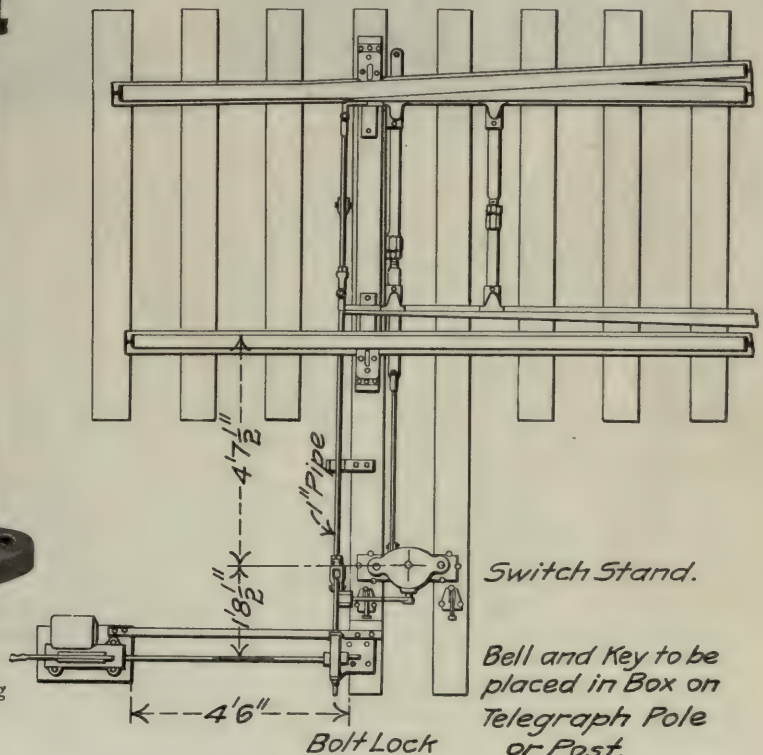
Hand Switch, Bolt Locked by Dwarf Machine, New York Central & Hudson River.
